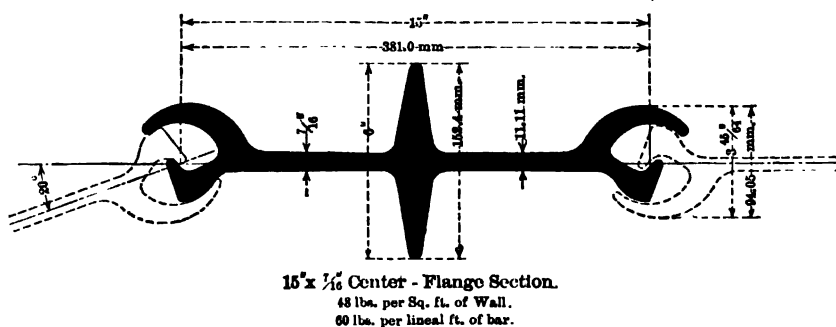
LACKAWANNA STEEL SHEET PILING.
